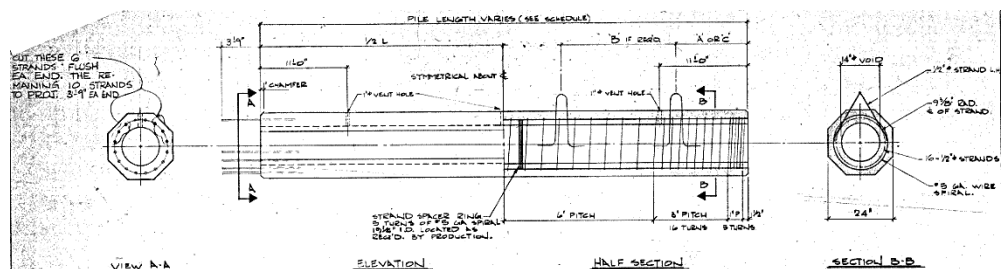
Pile Fabrication Diagram (Con-force DWG 0876-1)
